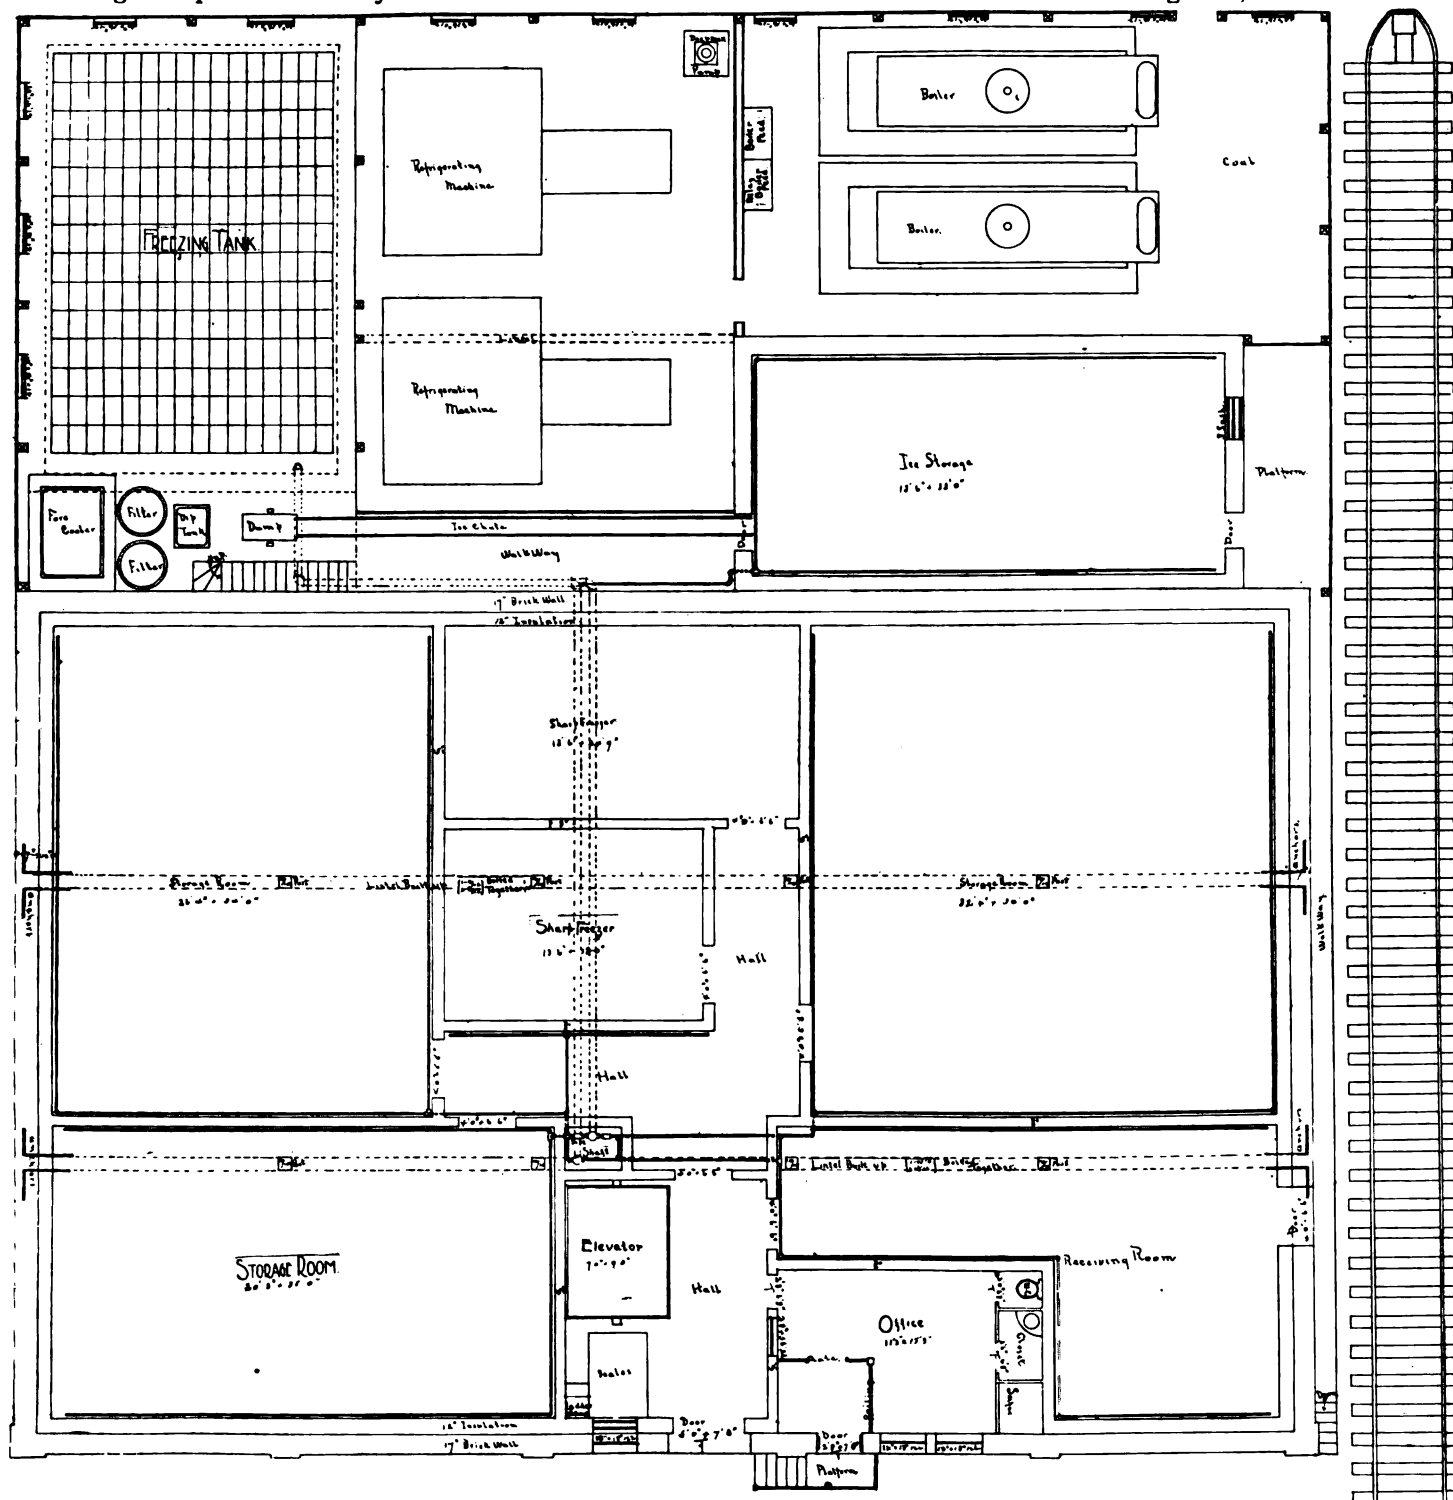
FIRST FLOOR PLAN, ICE PLANT AND COLD STORAGE WAREHOUSE—TOLEDO COLD STORAGE CO., TOLEDO, OHIO.
